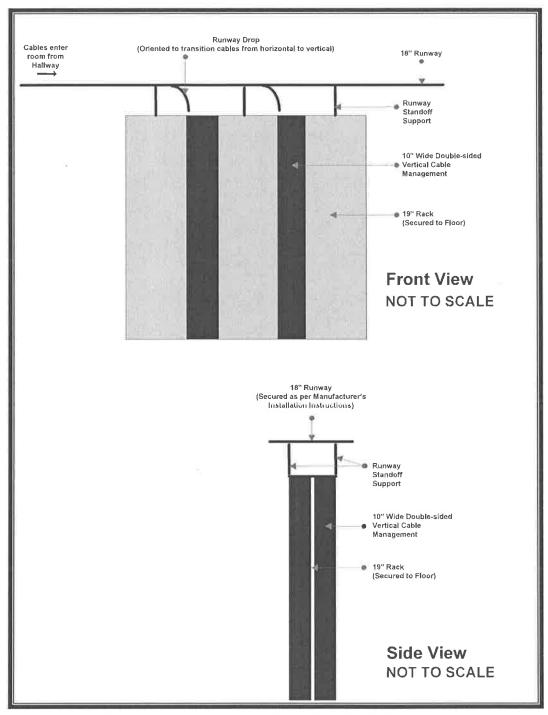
Horizontal Cross-Connect Front and Side View Rack Layout
